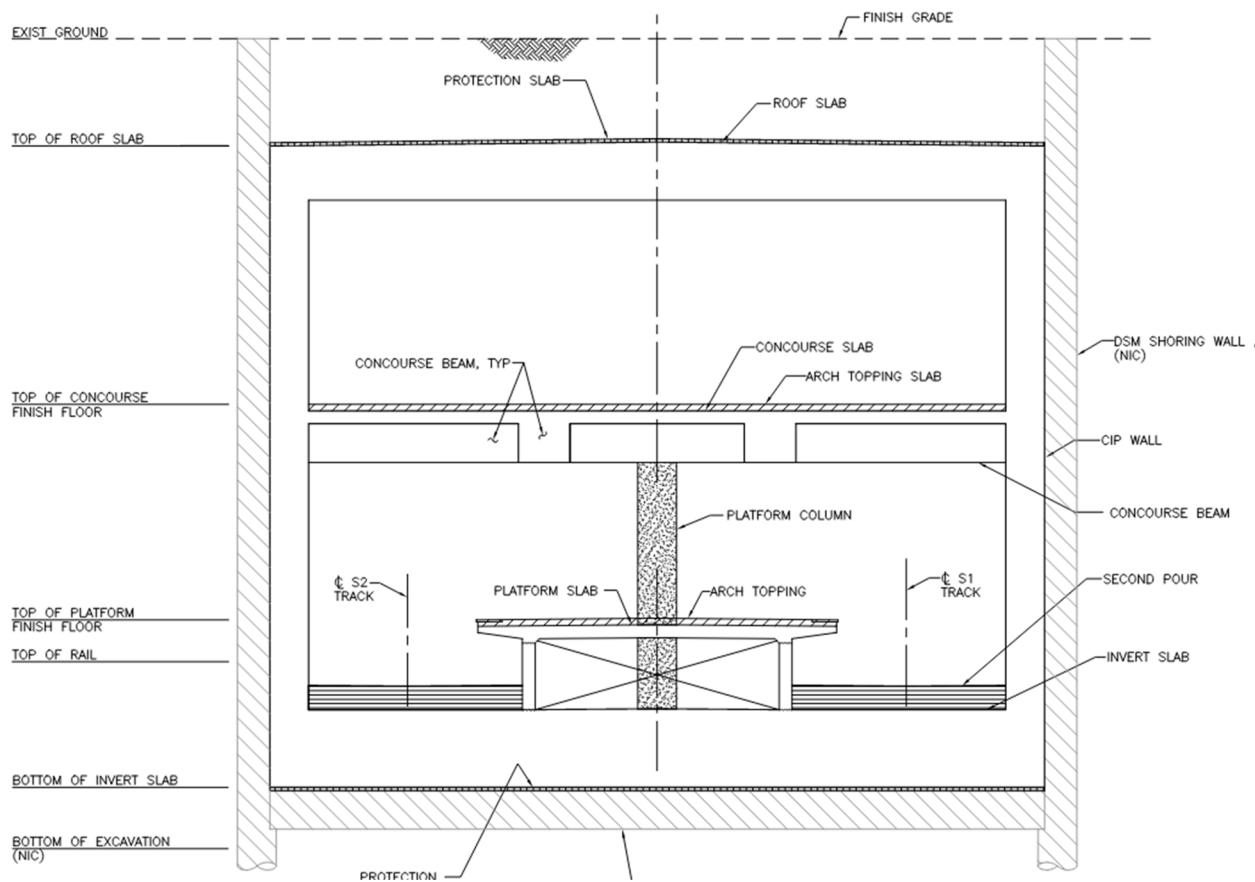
Typical Station Cross Section from Archived 2008 65% Design.
